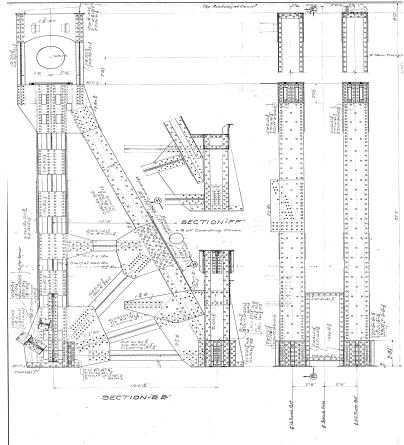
Burnside Bridge Piers 2 & 3, Trunnion Support Vertical Post which could be subject to high Bending forces
